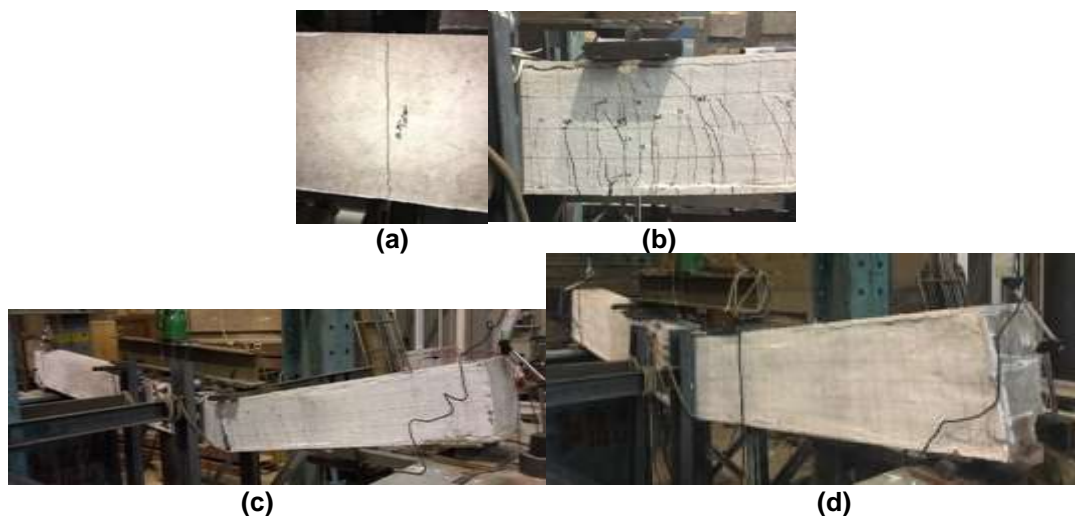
Failure mode of the composite beams: (a) cracks at the bottom; (b) cracks on the side; (c) SCB; and (d) DCB
